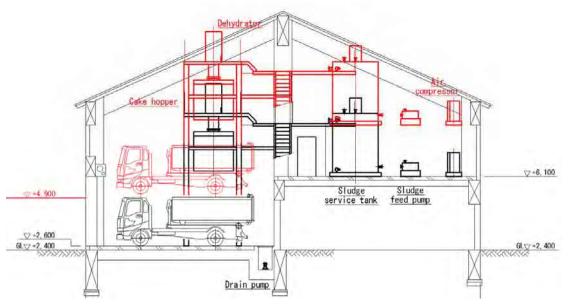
Layout of sludge room in the case of 4.7M ground level
